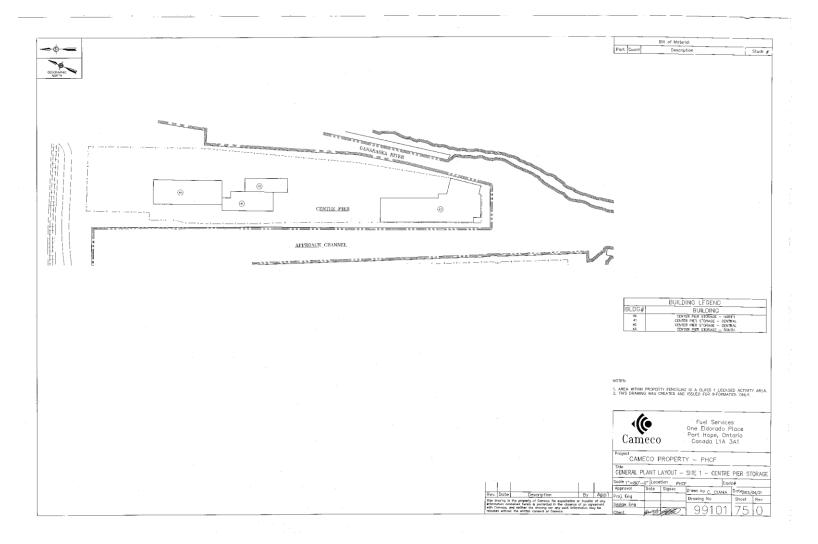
General Plant Layout – Site 1 – Centre Pier Storage
